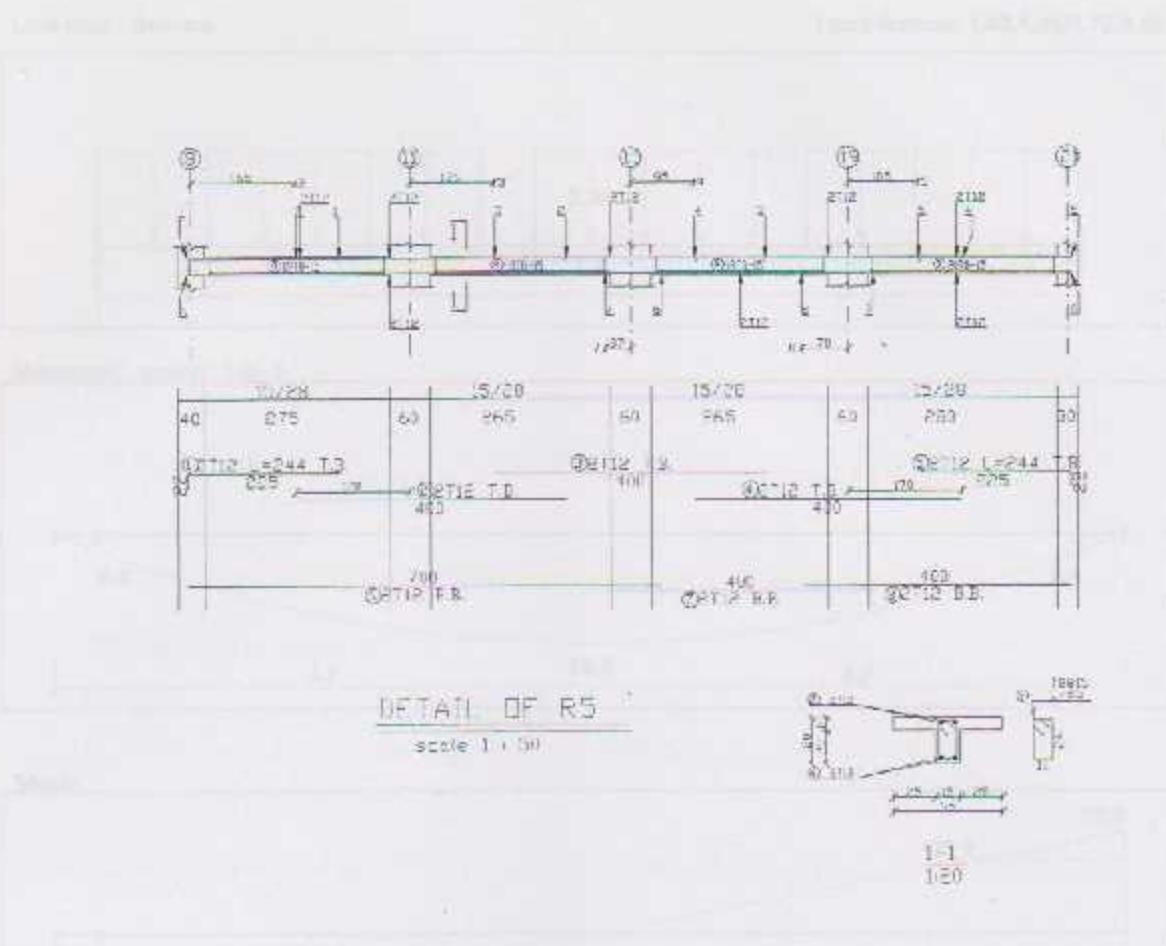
Plan View and Section in a One-Way Ribbed Slab
